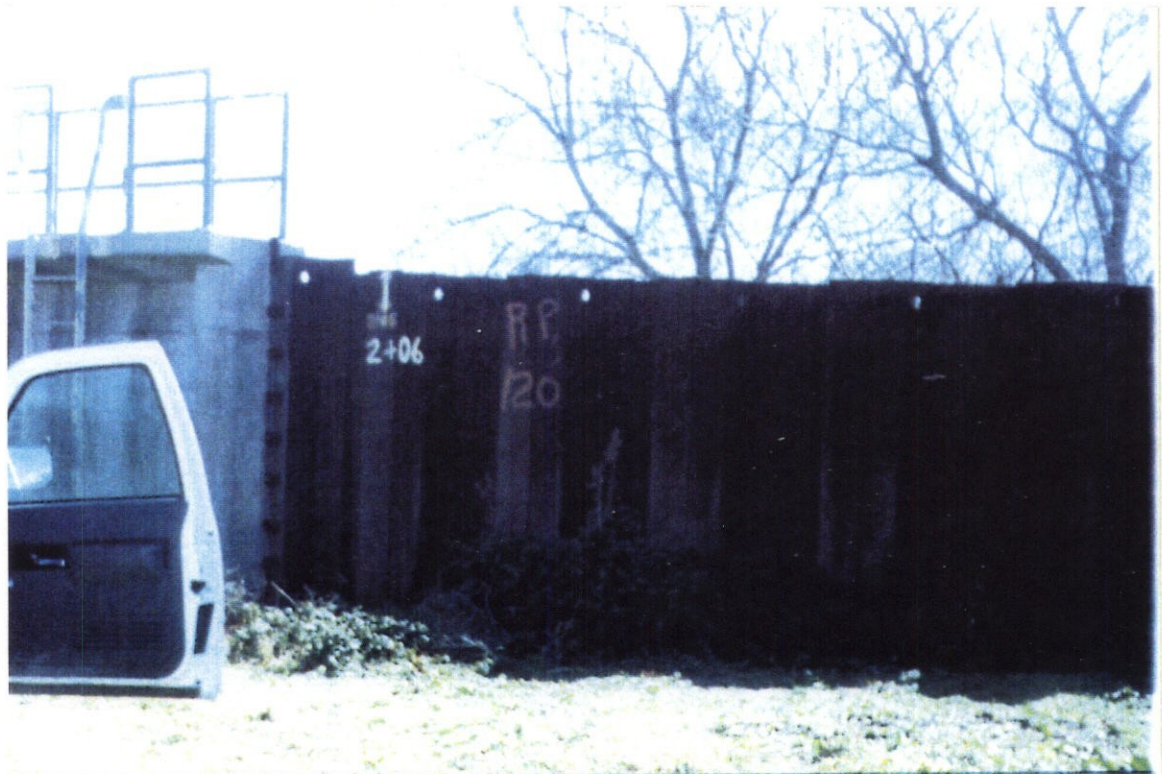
EAST END OF WEST SHEET PILE FLOODWALL. NOTE SETTLEMENT.
